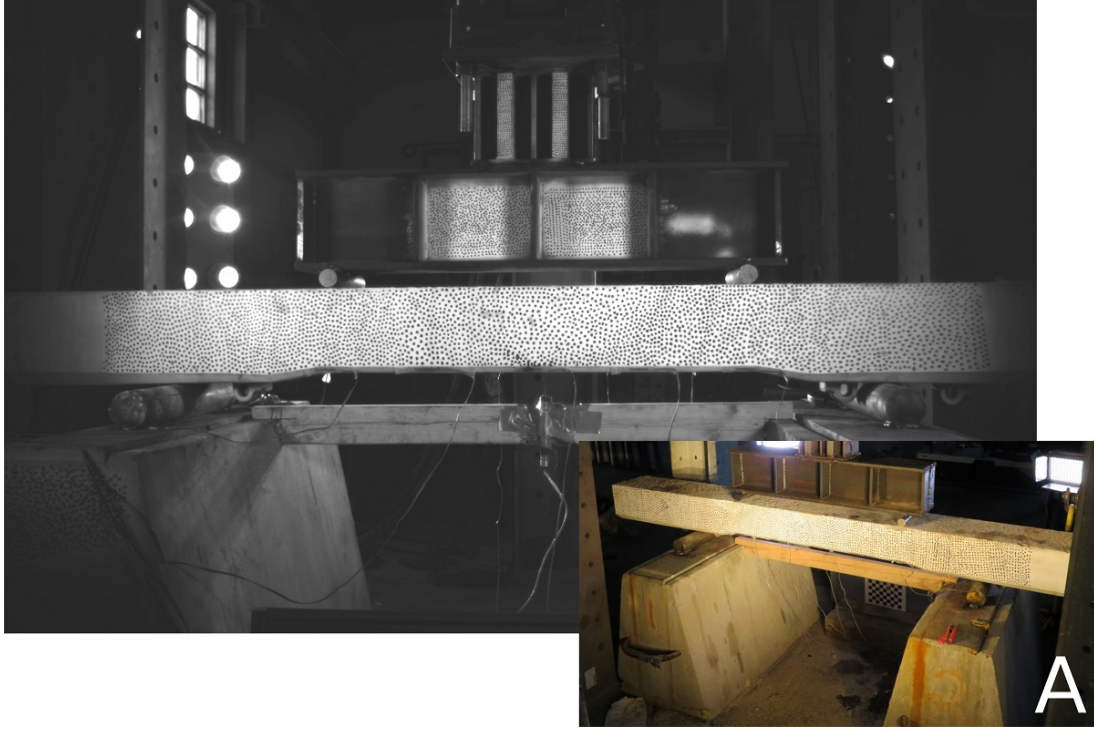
The reaction frame used for the load testing of the concrete tie. Image shows the four point testing for negative moment. Detail A shows the concrete blocks that provide the support to the specimen.
